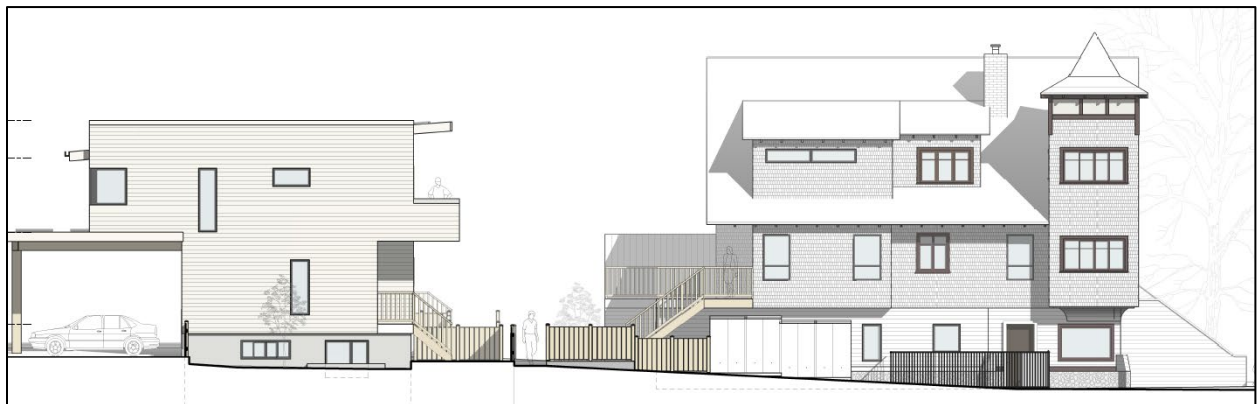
Western elevation view of the proposed alterations to 328 W 14th Street, 2021, including its back extension as well as the infill development at the back of the lot. (Source: METRIC Architecture)
